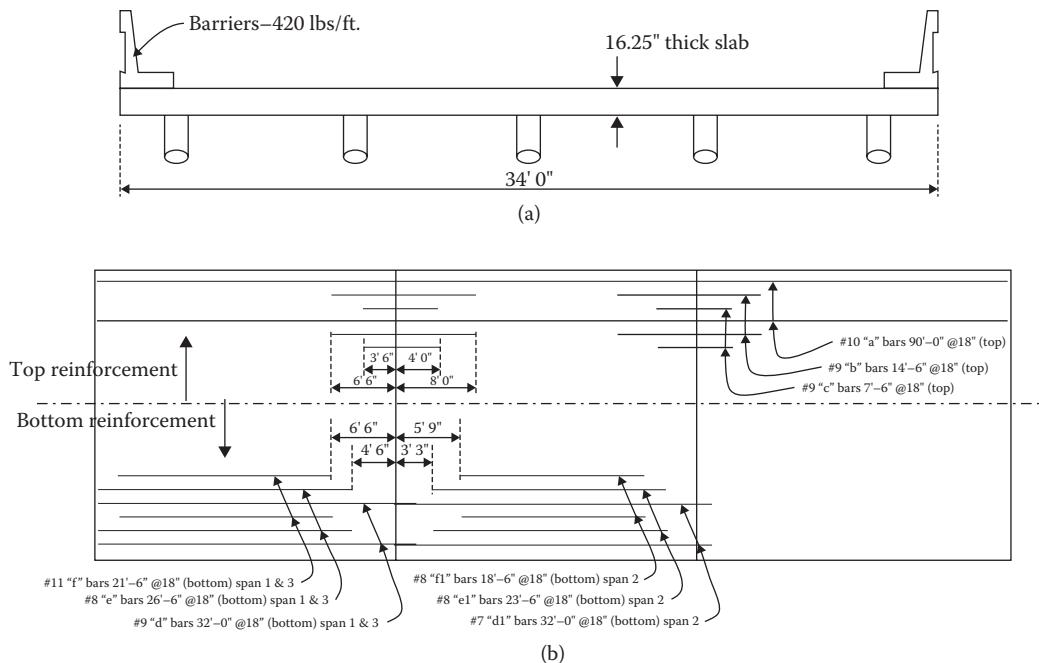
Details of three-span continuous RC slab bridge example: (a) Typical section and (b) reinforcement layout of 34-ft.-wide RC slab.
